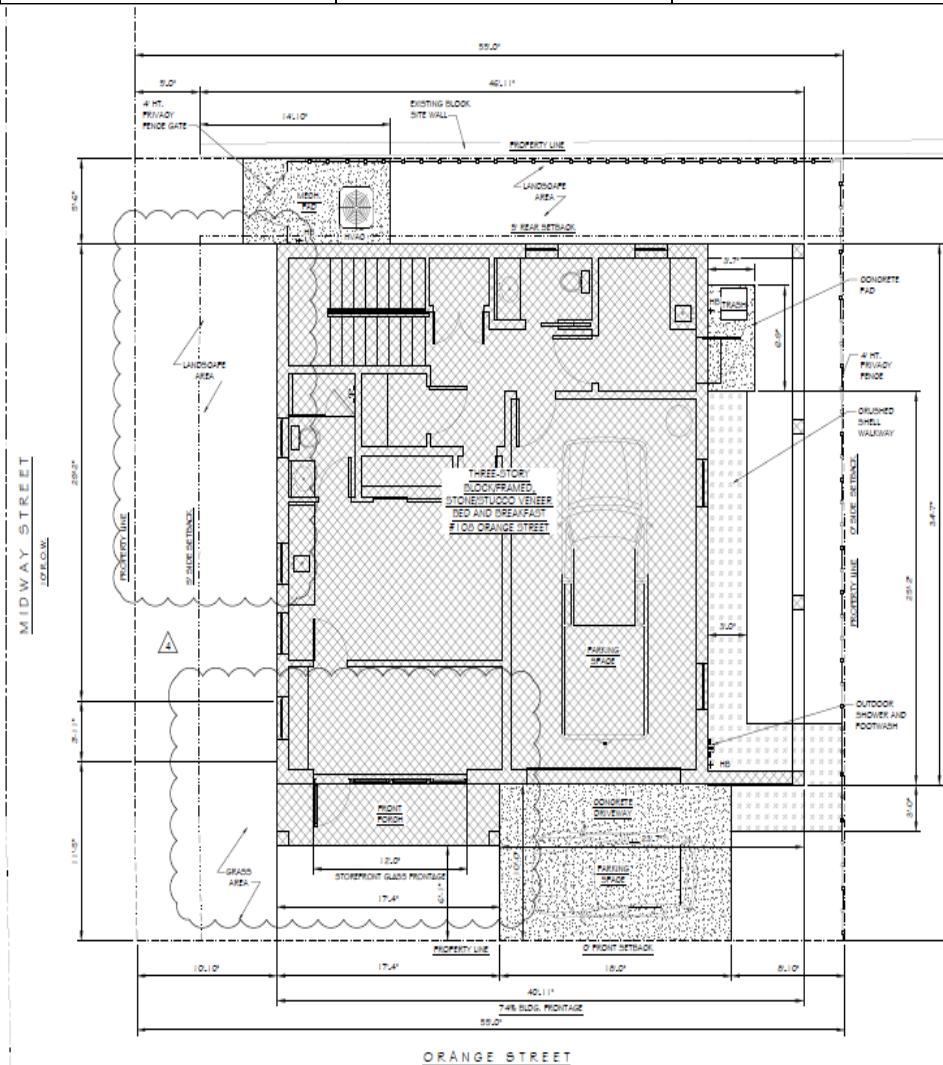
Proposed Site Plan 108 Orange St, Neptune Beach, FL
